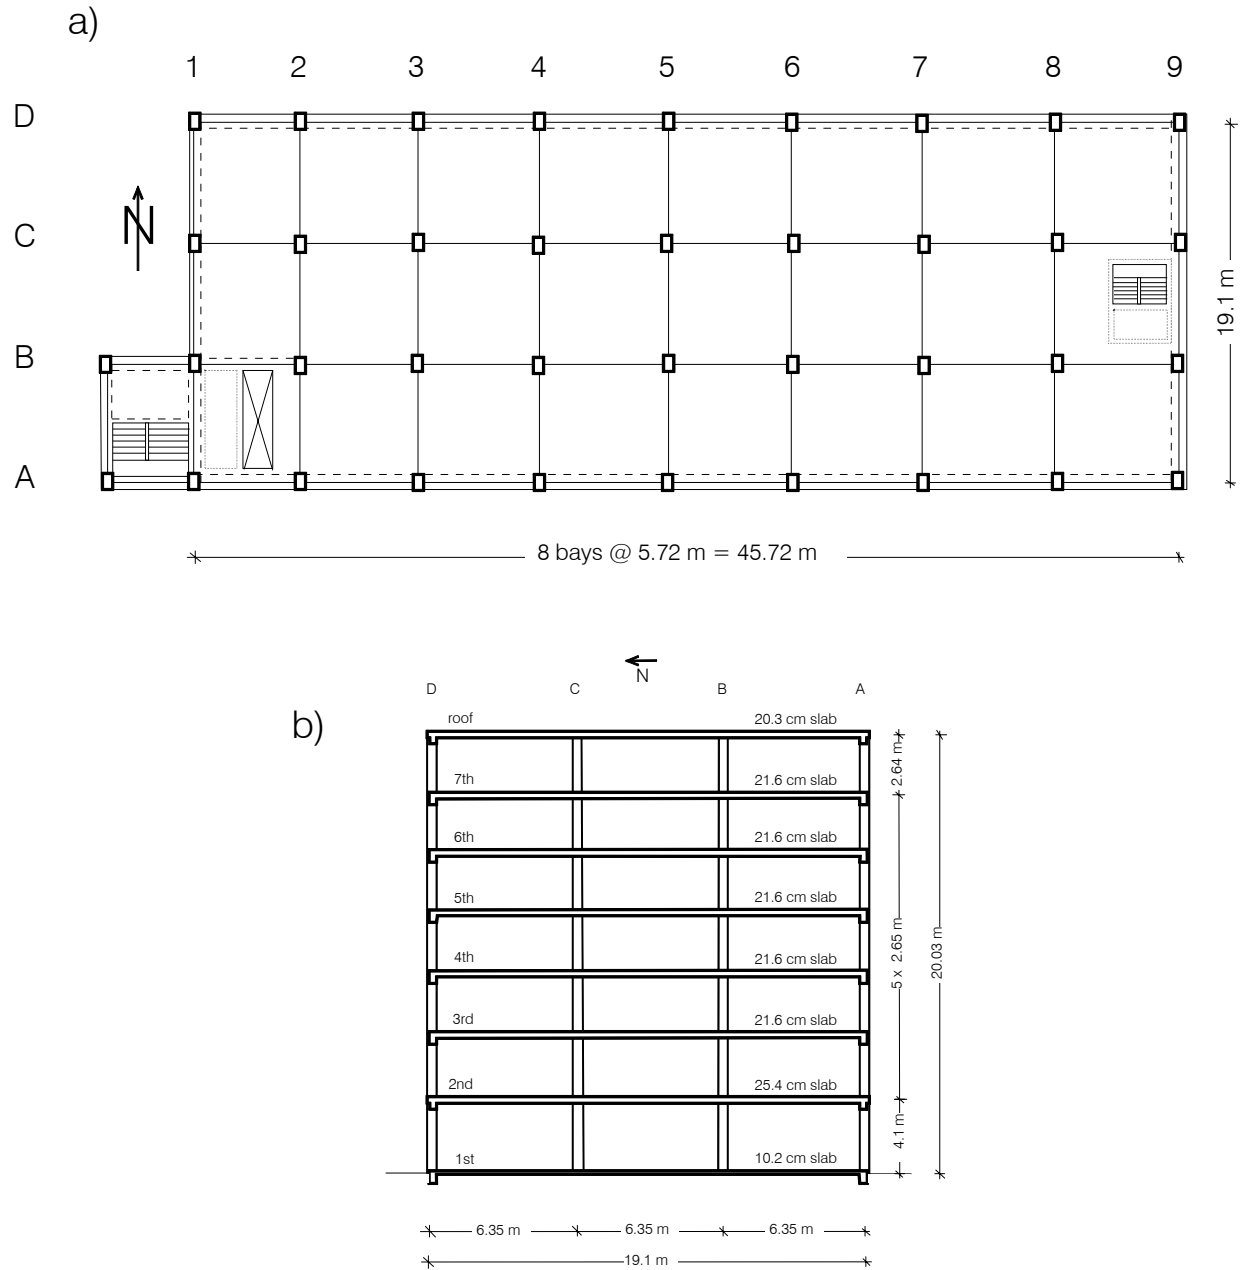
Typical Floor Plan (a), and North-South section (b).
